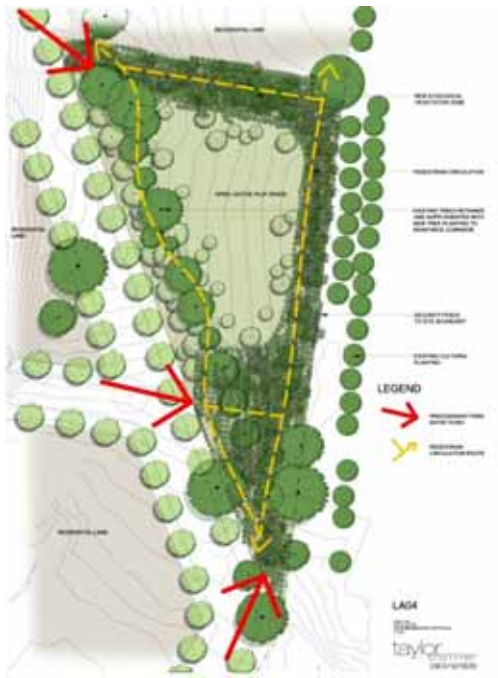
Preliminary concept for proposed 'Canal Park' adjacent to the water canal
